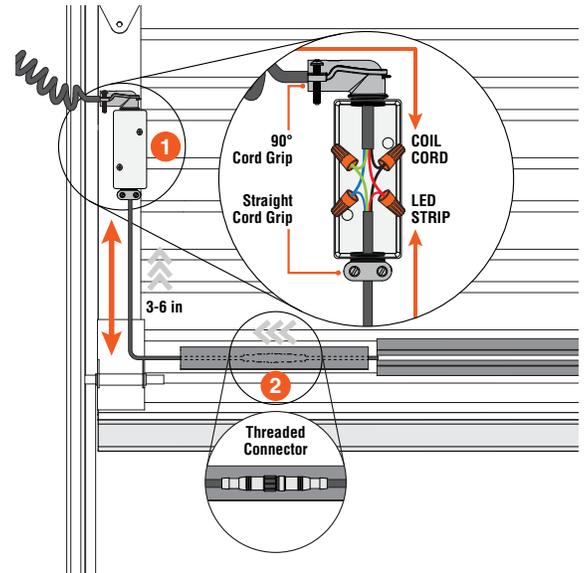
A: Sectional Door Junction Box Placement & Wiring
